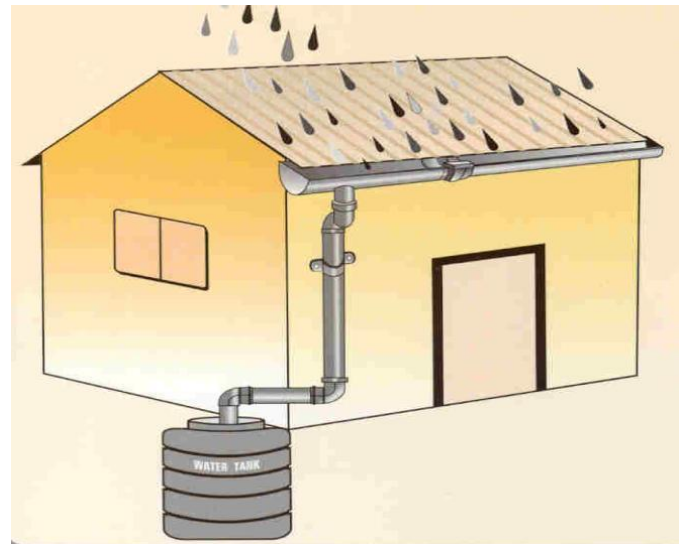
Simple schematic of a RWH system with guttering, downpipes and above ground water tank
